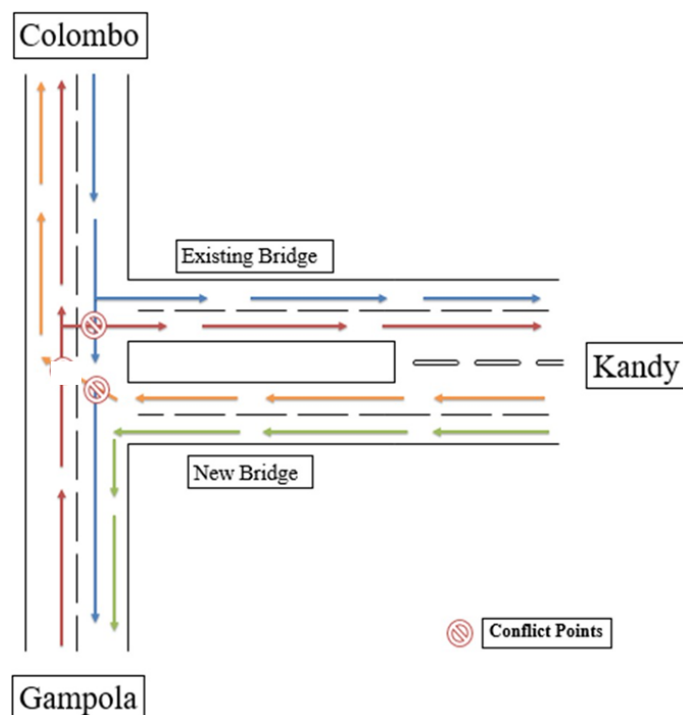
Sketch showing the new bridge, existing bridge and traffic directions in alternative 2
